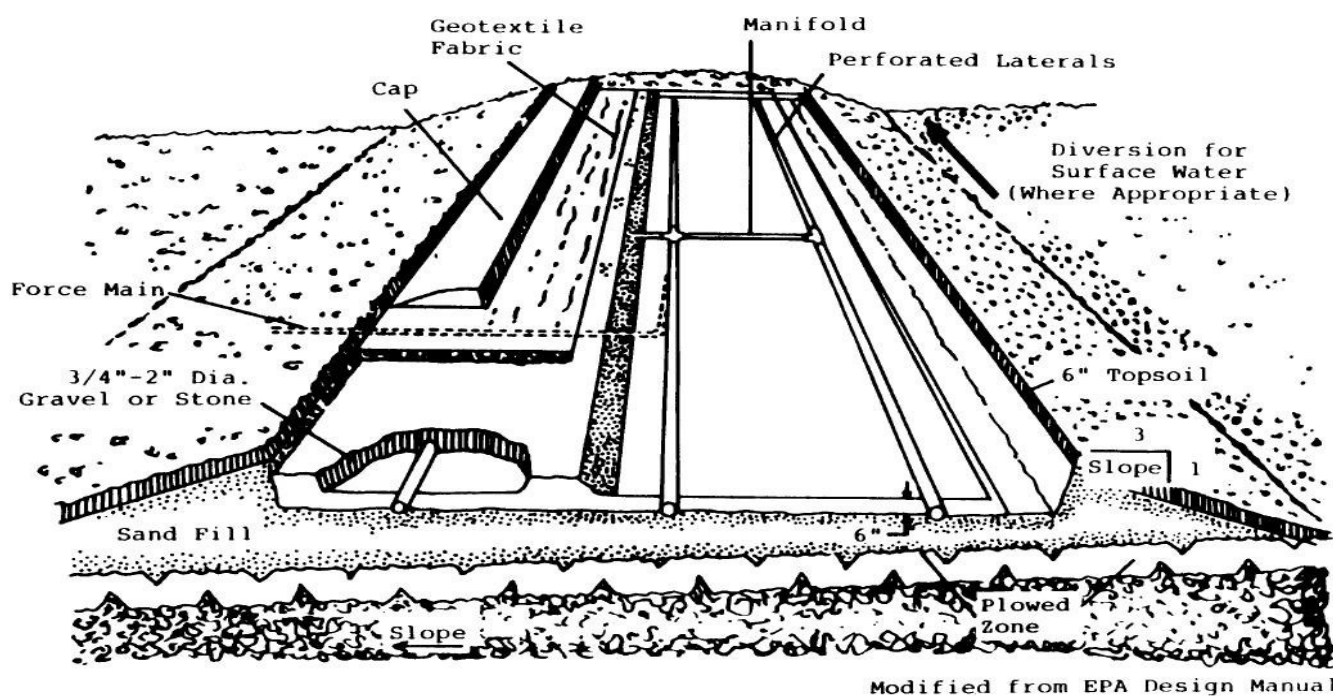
DETAILED SCHEMATIC OF A SAND MOUND SYSTEM
